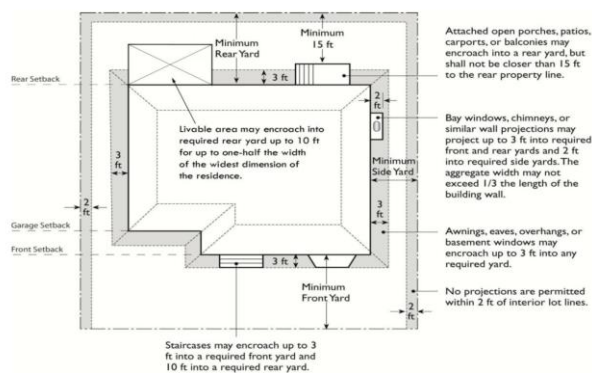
A: BUILDING PROJECTIONS
